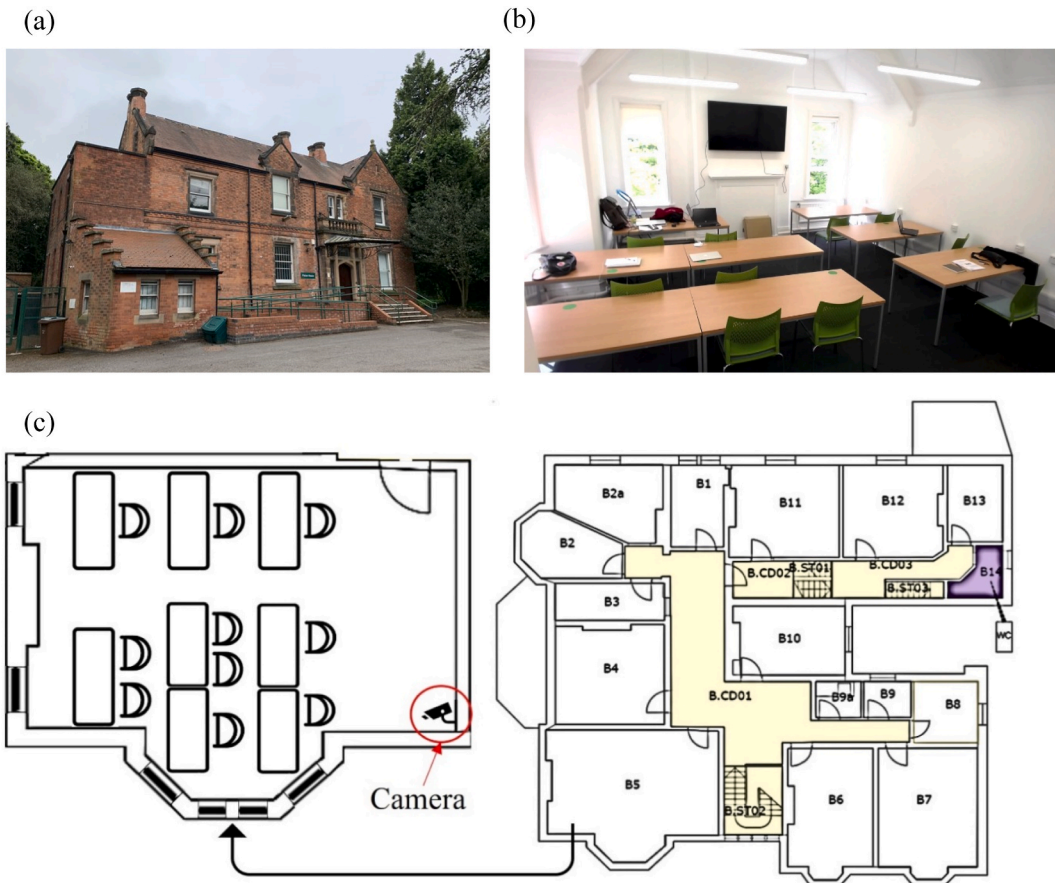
(a) External view of Paton house; (b) View of test room from the camera; (c) Layout of the first floor and test room (B5).
